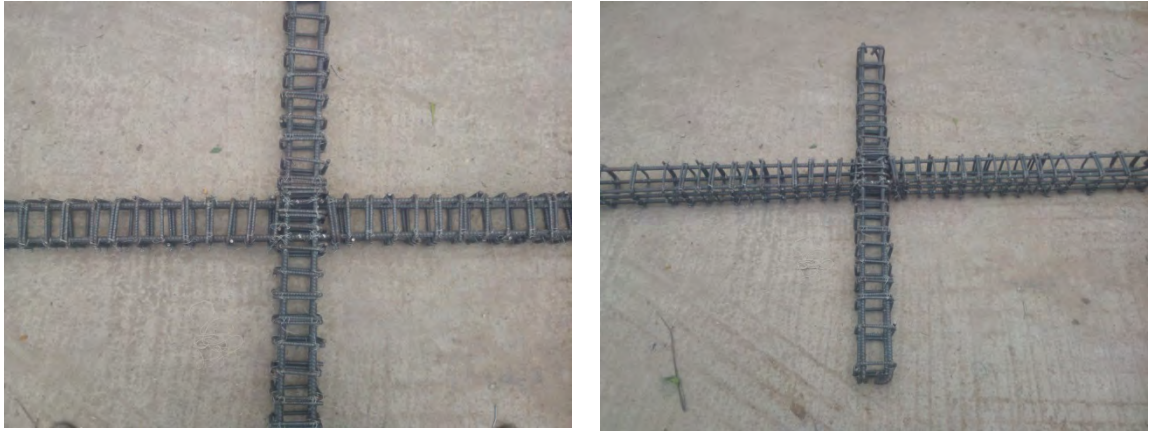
Joint Reinforcement Arrangement of Type 2A (With Two Ties at Joint)
